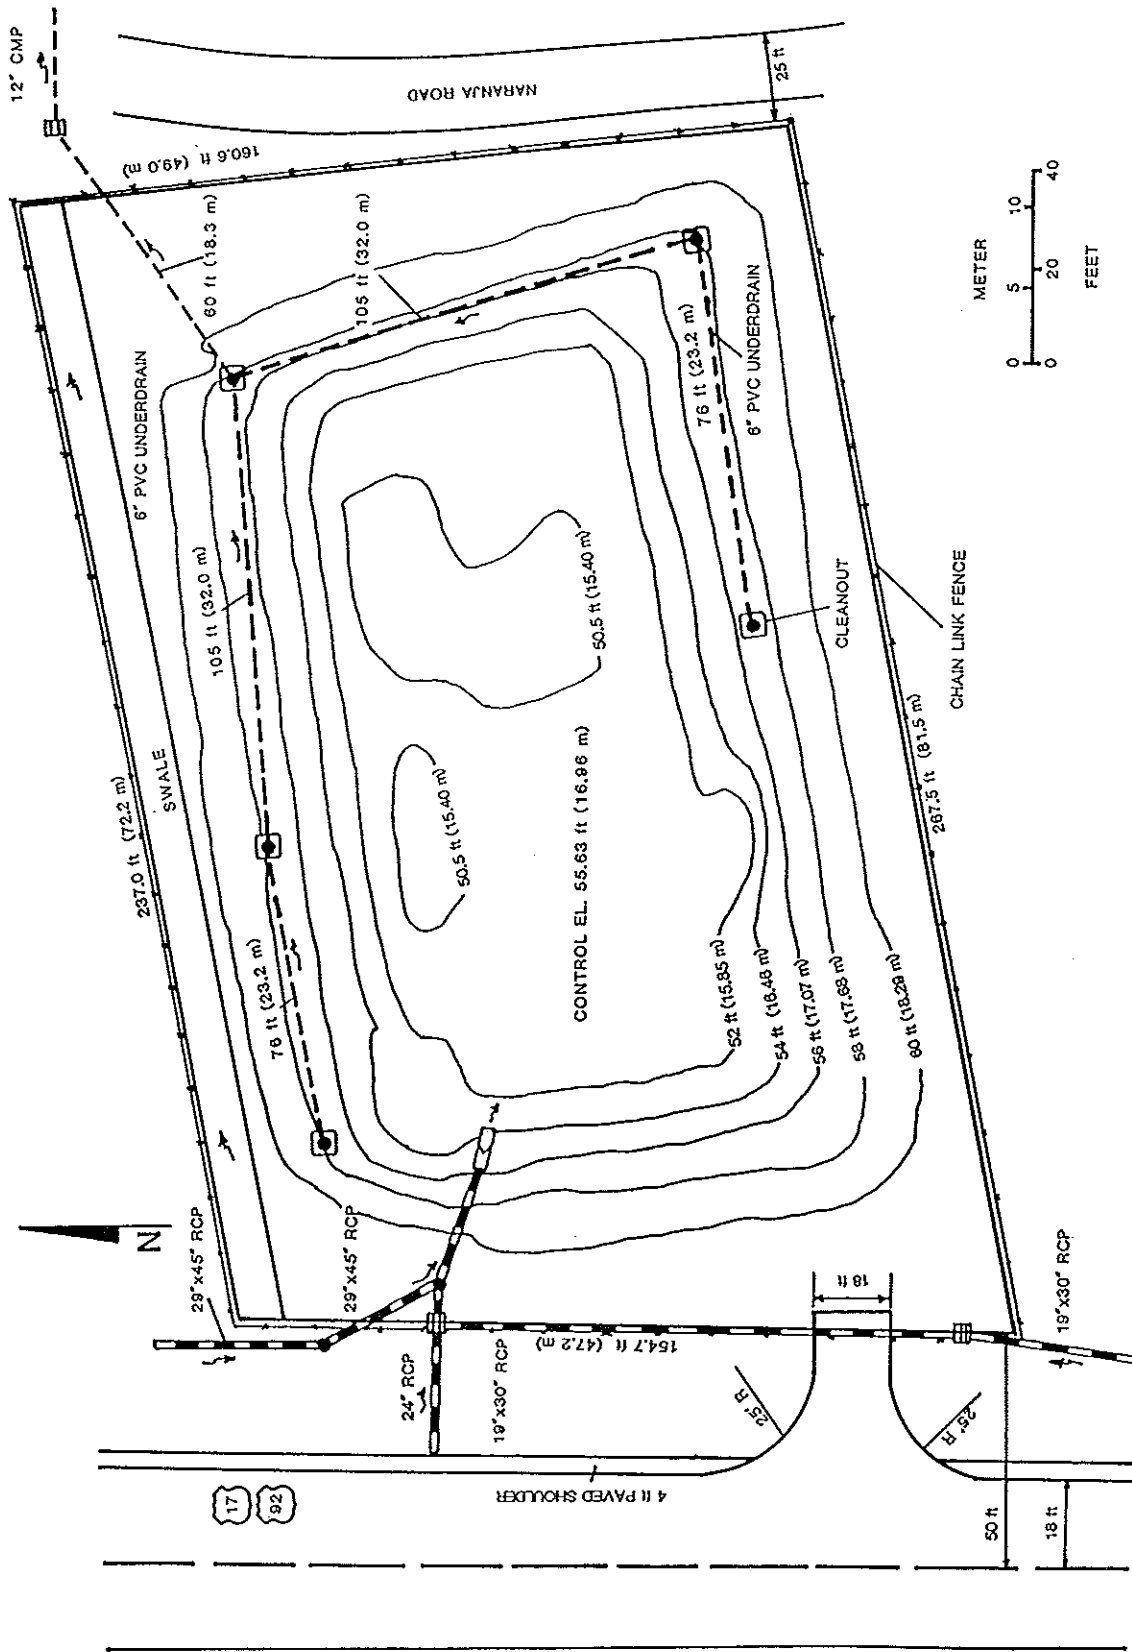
Drainage and Pond Details for the DeBary Detention with Filtration Site.
